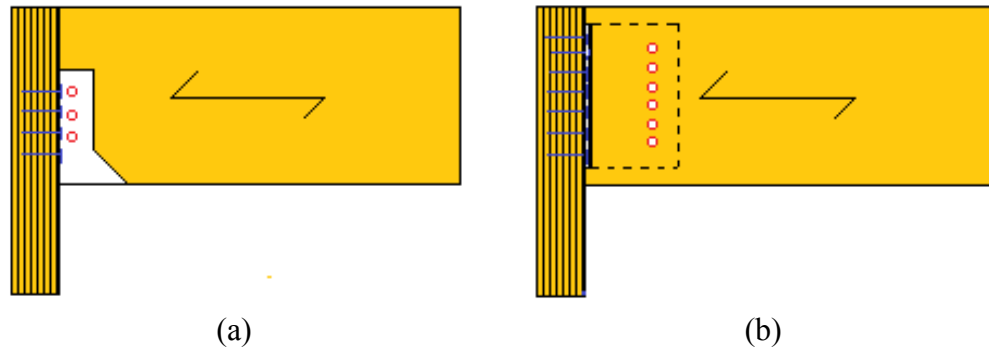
Beam-to-beam on-side connections with a metal hanger: (a) connection with an exposed beam shoe/hanger and (b) connection with a concealed beam hanger (Source: Kovanen, H. 2014)
